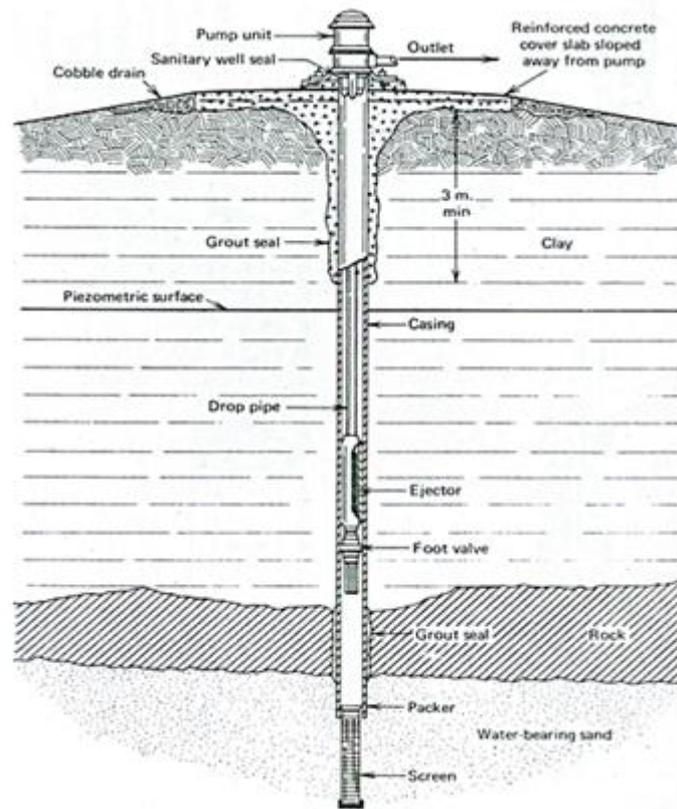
A drilled well illustrating grout seal, concrete slab, and well seal for sanitary protection. (Source: Todd, 1980)
